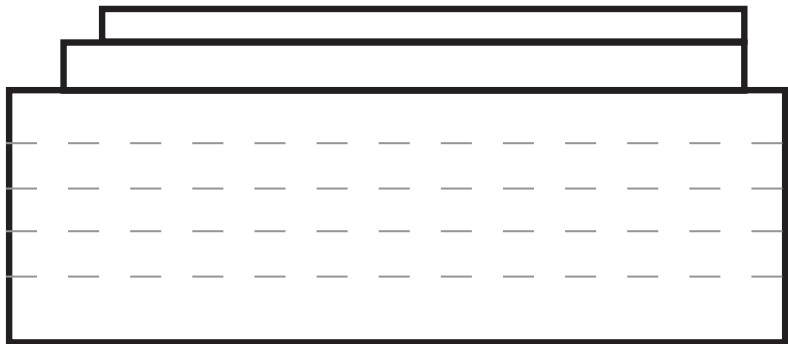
Section 2- Built Form to Open Space Section SCALE 1:250@A3
